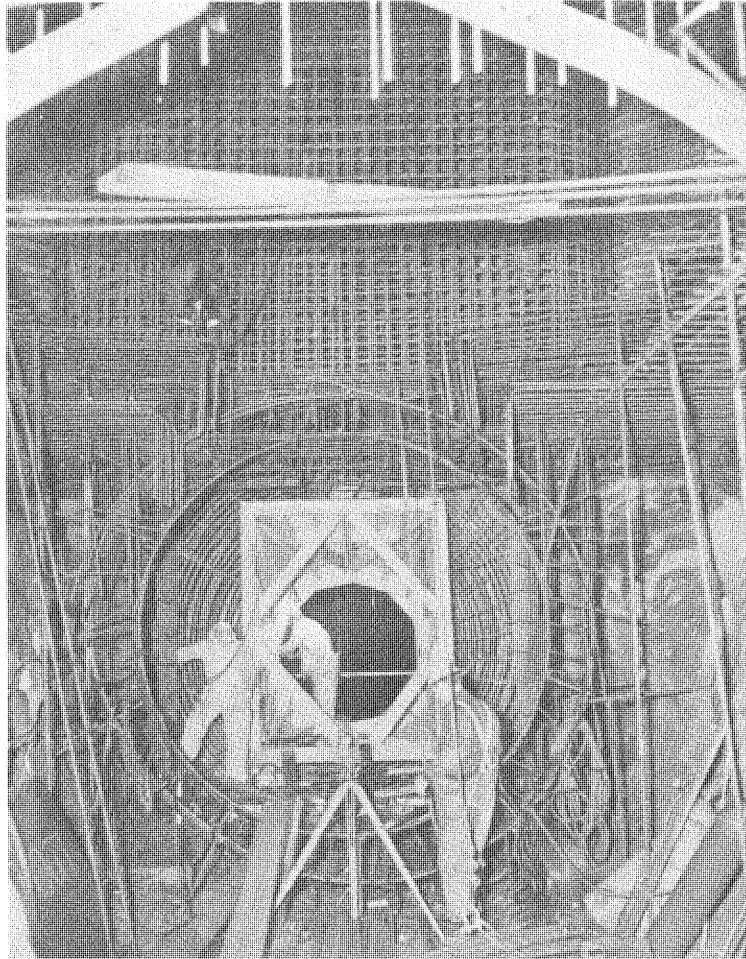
Downstream view along tunnel centerline showing reinforcement steel in surge tank and form being placed for rectangular-to-round transition. P783-908-1664, July 20, 1954.
